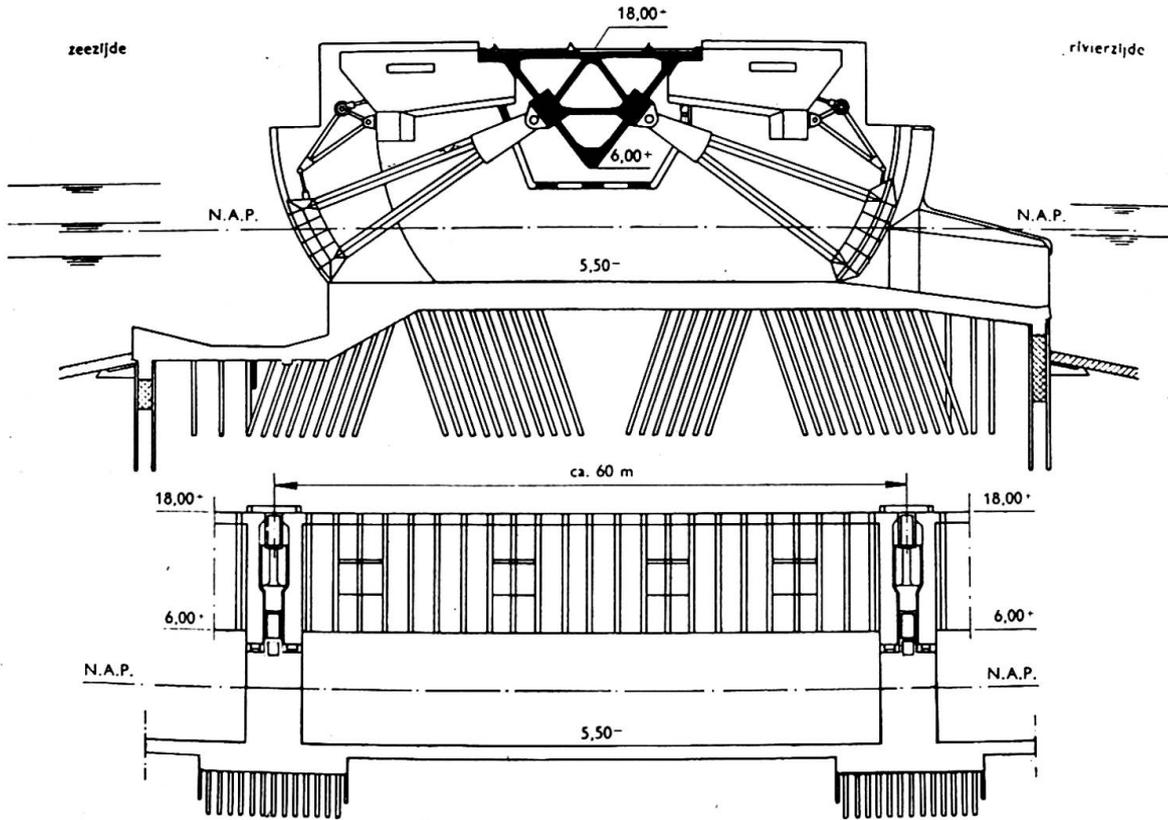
Transverse section of bridge, sluice gates and sill with pile-foundation; front view of bridge with piers.
